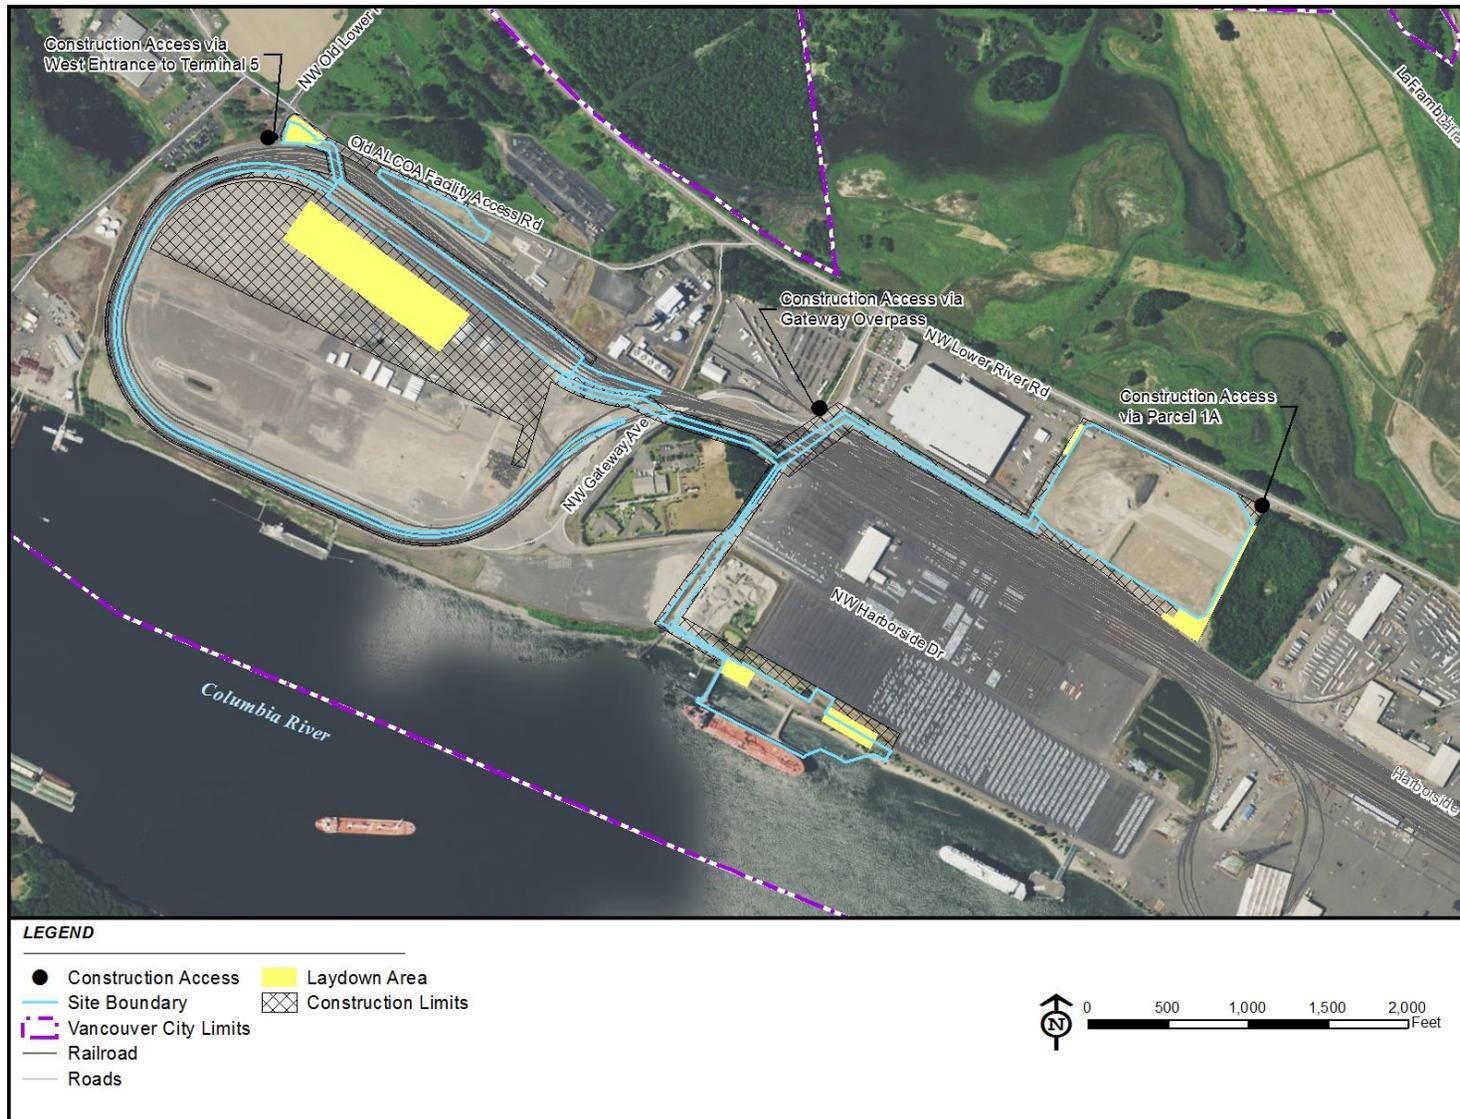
Temporary Construction Boundary and Laydown Areas (Revised)
